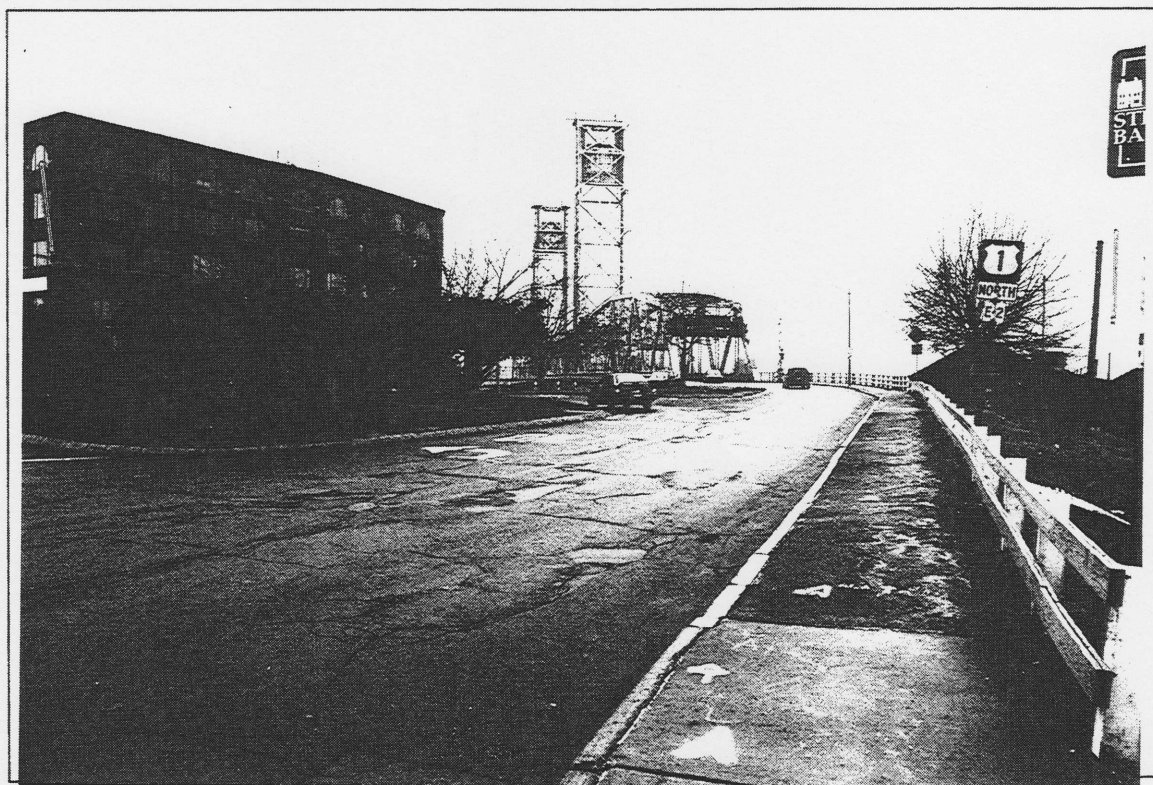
Portsmouth Approach View Toward Memorial Bridge
